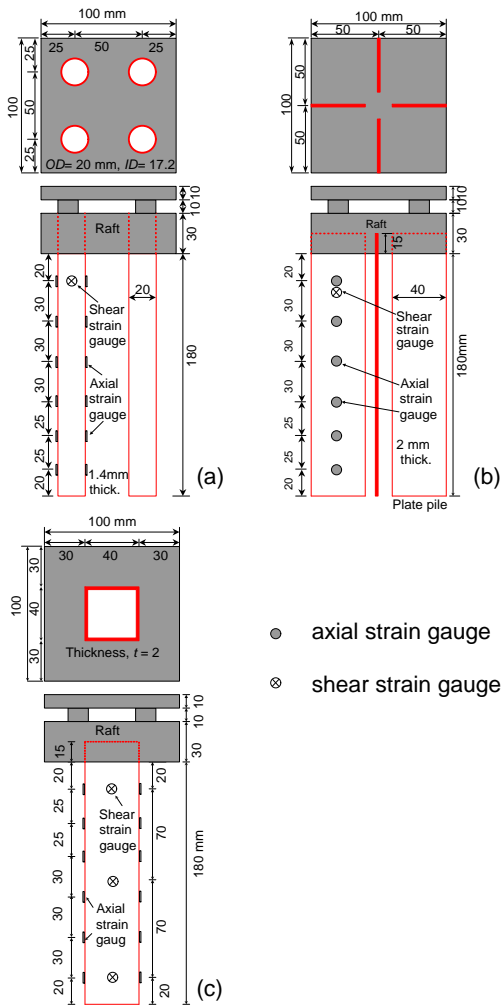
Model pile foundations: (a) Pipe pile foundation; (b) Plate pile foundation; (c) Box pile foundation.
